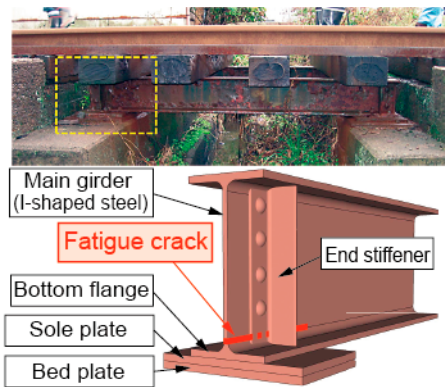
Fatigue cracking around the I-beam bridge support
